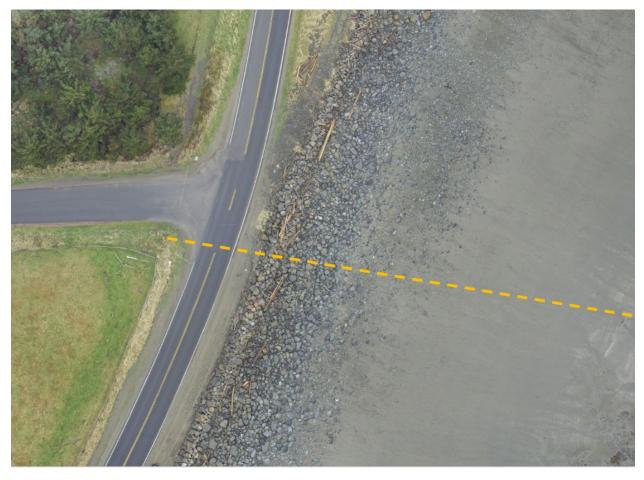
Overview of cable alignment at intersection of Yellowhead Highway and Wiggins Road.
